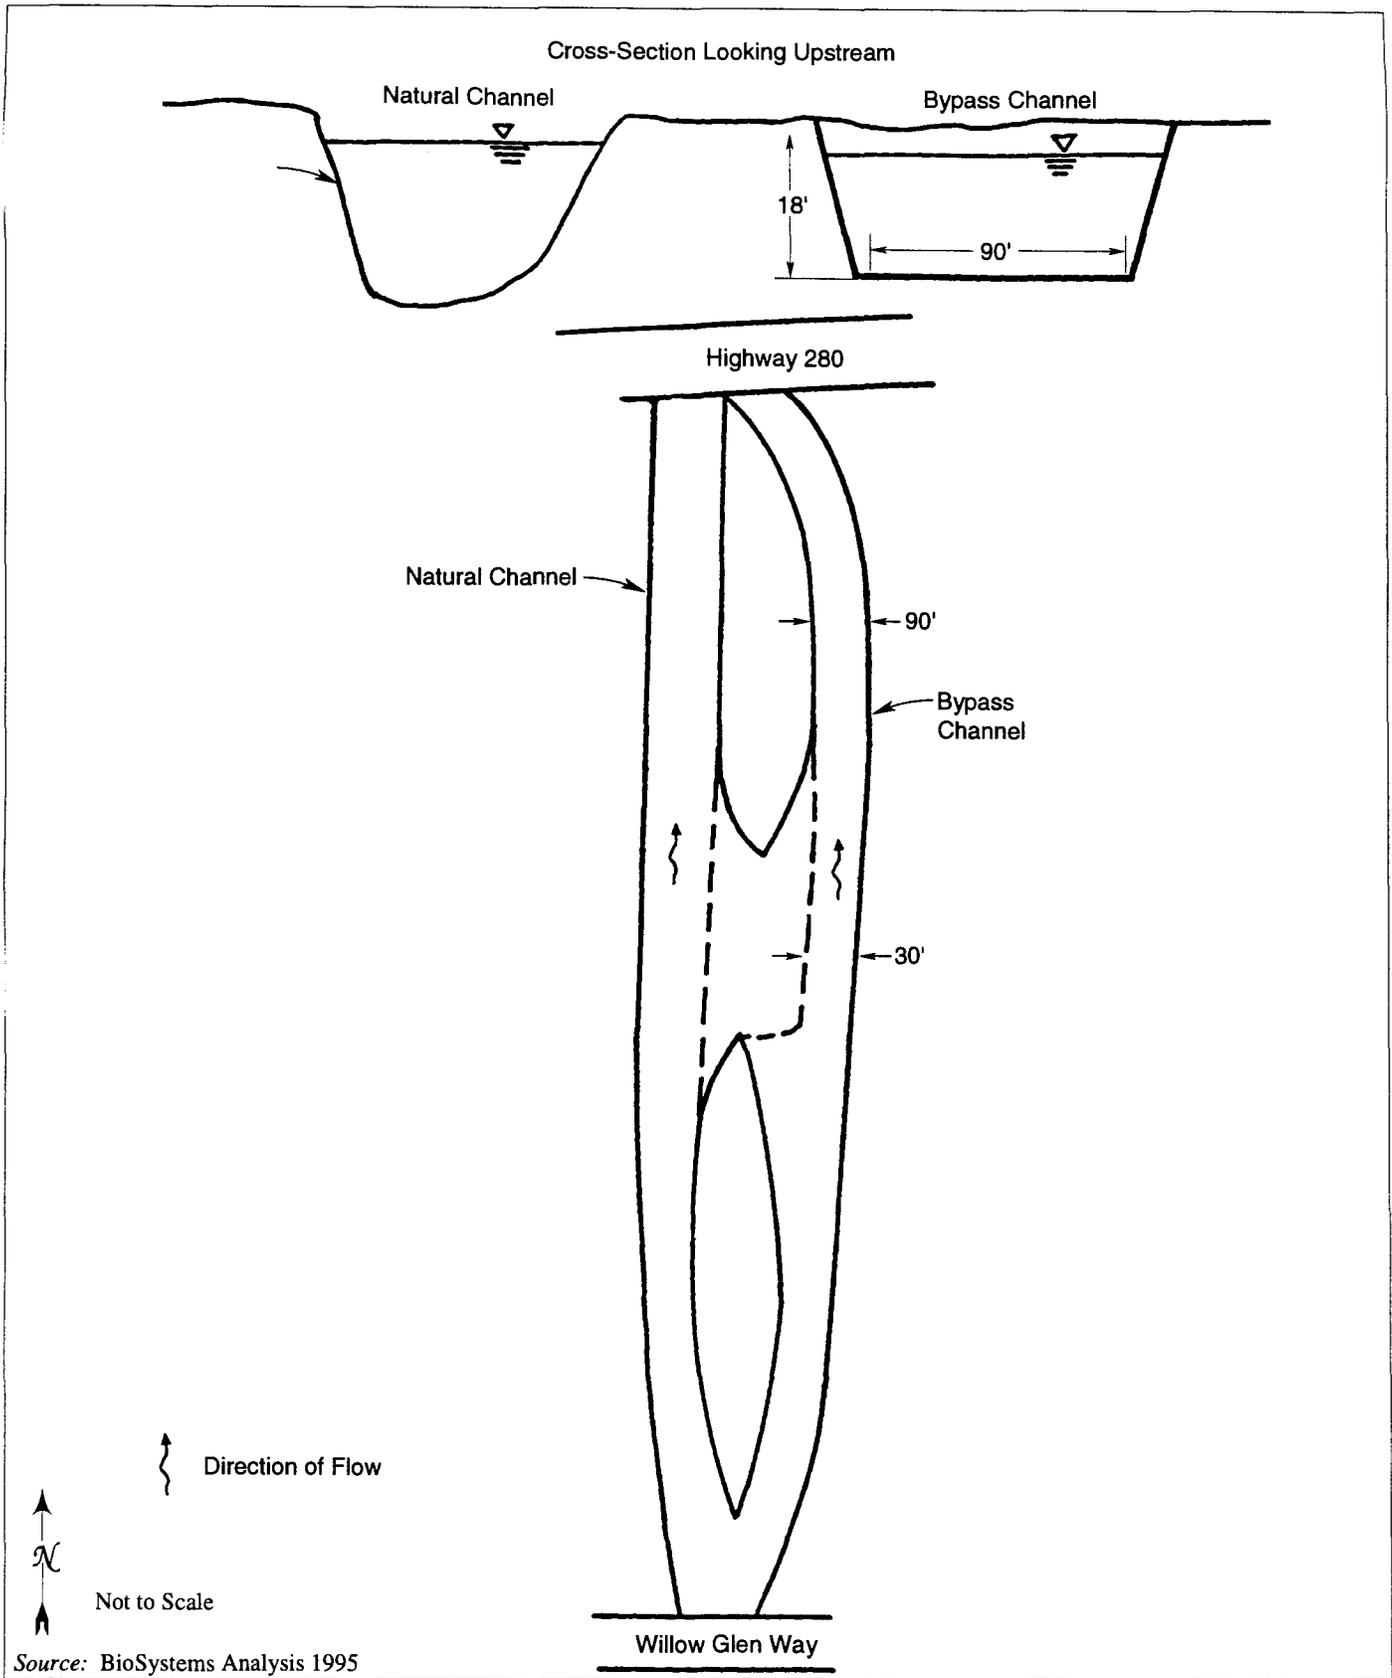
Conceptual Earth Bypass Channel Plan Design
